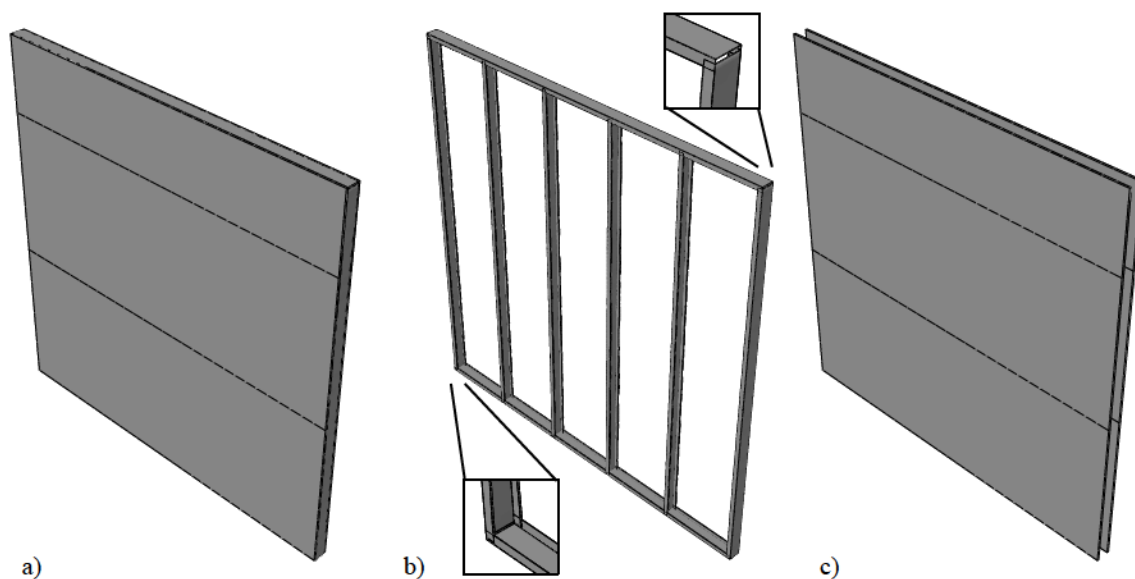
Wall model components, a) Wall model, b) CFS frame, and c) gypsum boards
